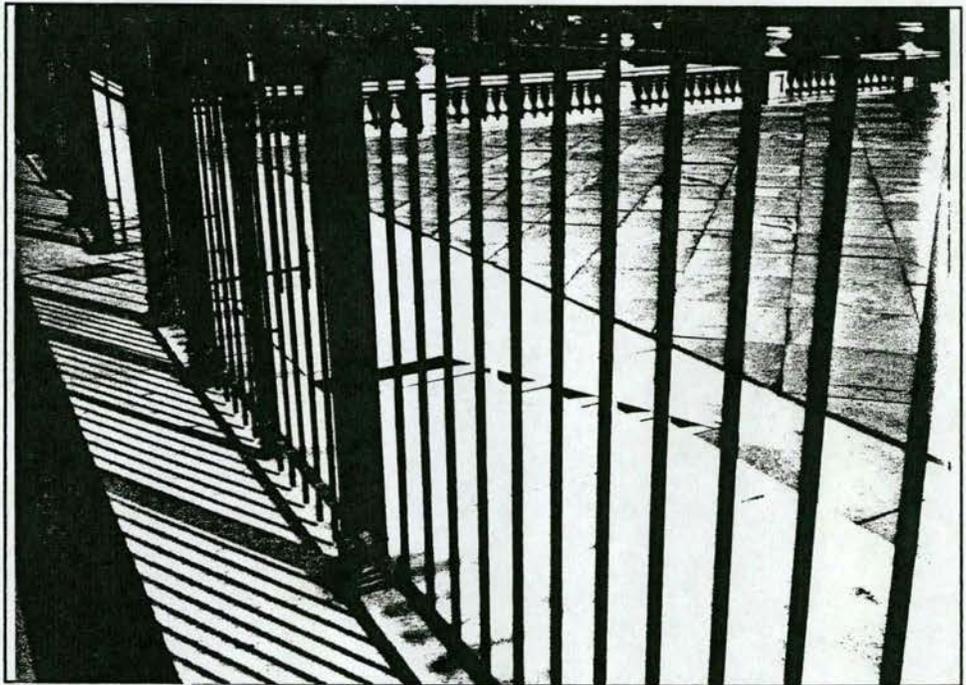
Fabricated metal service ramp over stairs at Pennsylvania Avenue entrance to OEGB precinct.
